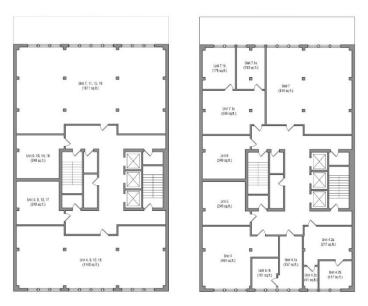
, 295 (left to right): Building 10, second floor (1921); same floor (1979). 1'' = 32'. North is up.
